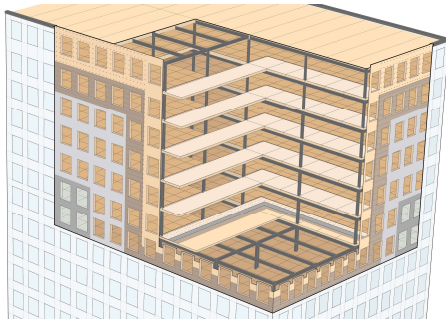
A: Model of composite structure of Bolted-steel with Cross-Laminated Timber (CLT) floor & non-structural CLT building envelope layers
